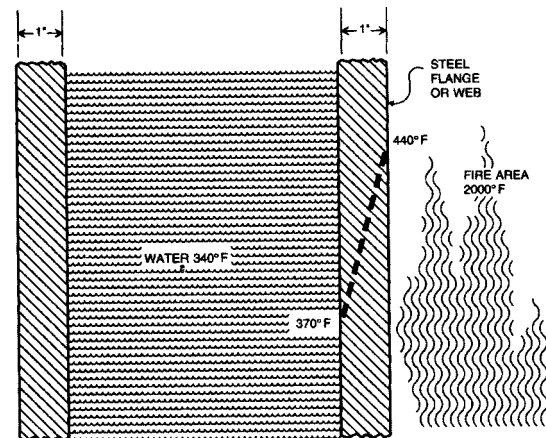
Tubular steel columns filled with water for fire resistance with temperature variation during exposure to fire. Illustration courtesy of the American Iron and Steel Institute, *Fire Protection Through Modern Building Codes*.
